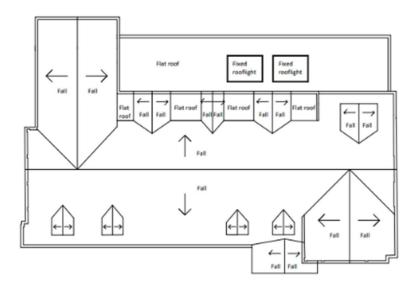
Ashwick House Development Proposals – Existing and Proposed Site Plans
